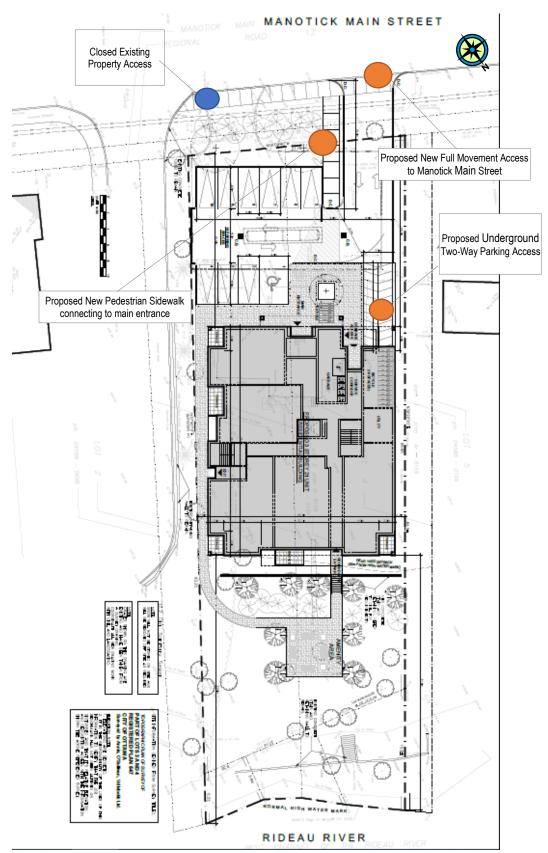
Proposed 5497 Manotick Main Street: Site Plan (August 2021)
